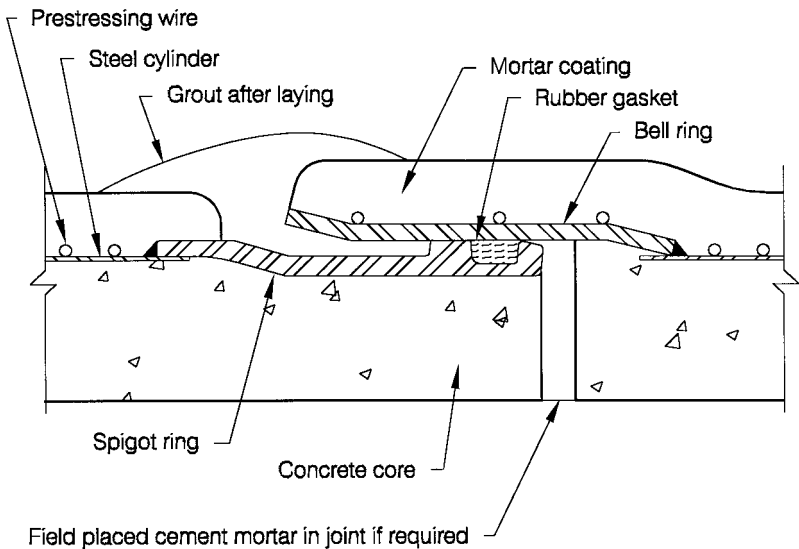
Mortaring of interior joint recess for prestressed concrete cylinder pipe.
